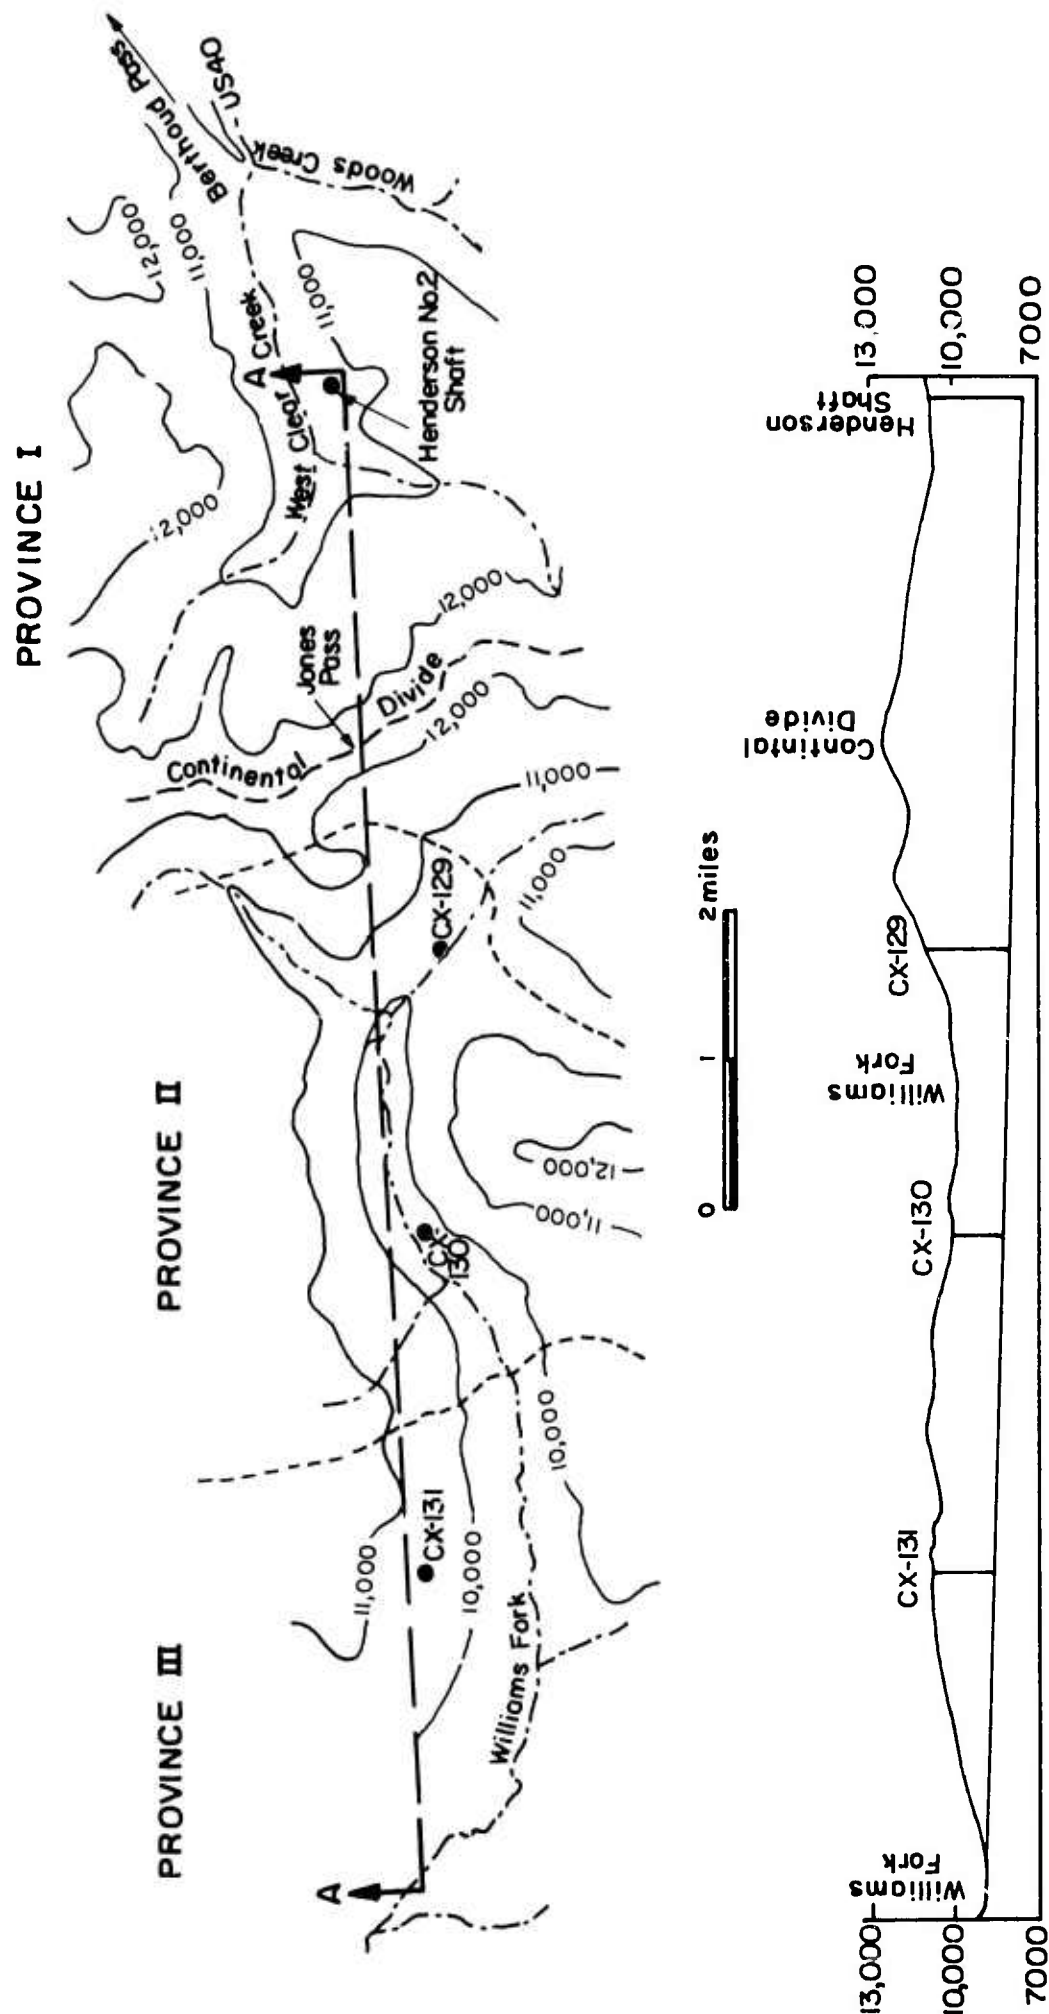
GENERALIZED PLAN AND SECTION OF THE HENDERSON MINE HAULAGE TUNNEL
